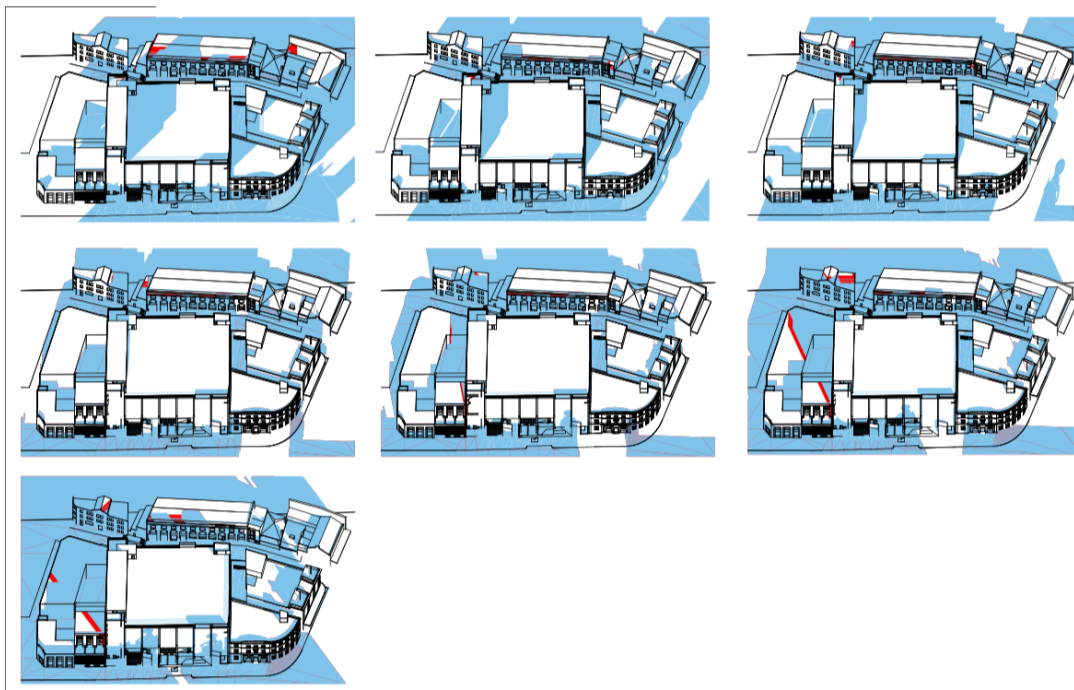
Current and proposed overshadowing – view from the sun 21 June (Durbach Block Jaggers)
